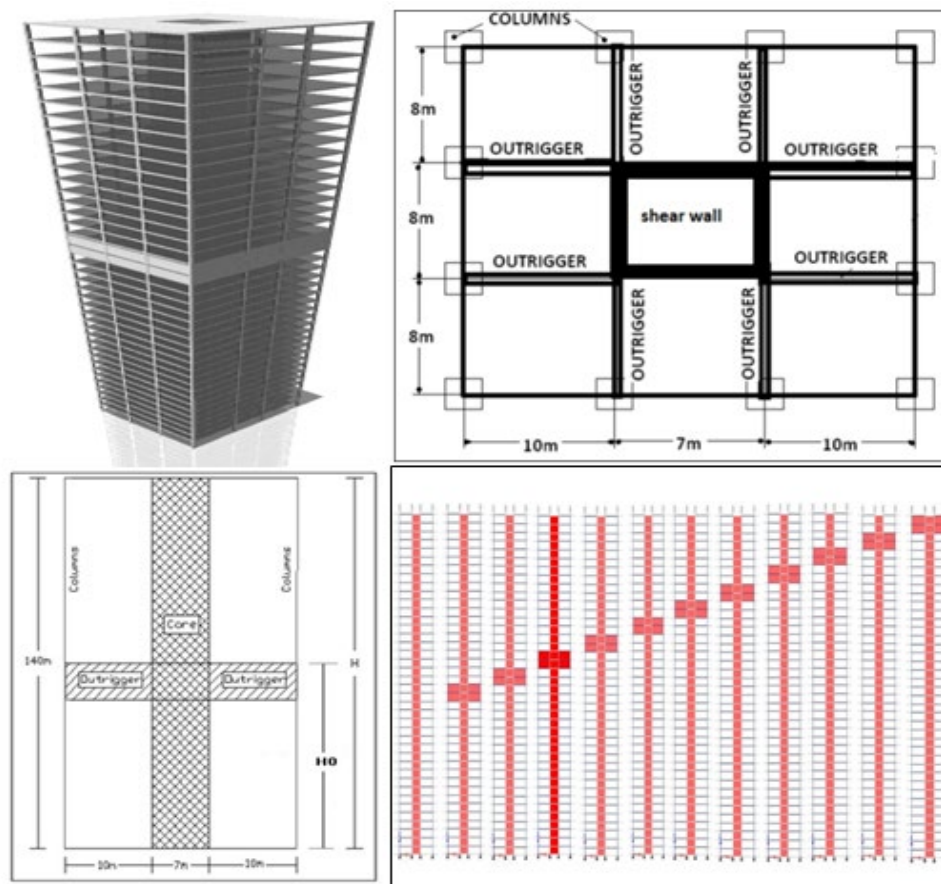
Plan, isometric view, elevation and location of the outrigger details for different models
